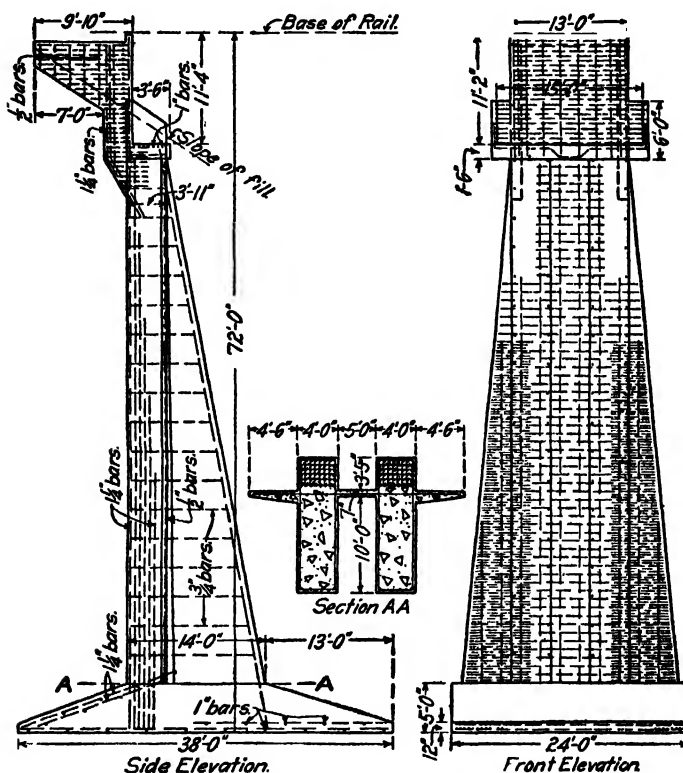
b*.—Reinforced-Concrete Buried Abutment, Louisville and Nashville Railway Bridge over Cumberland River.
